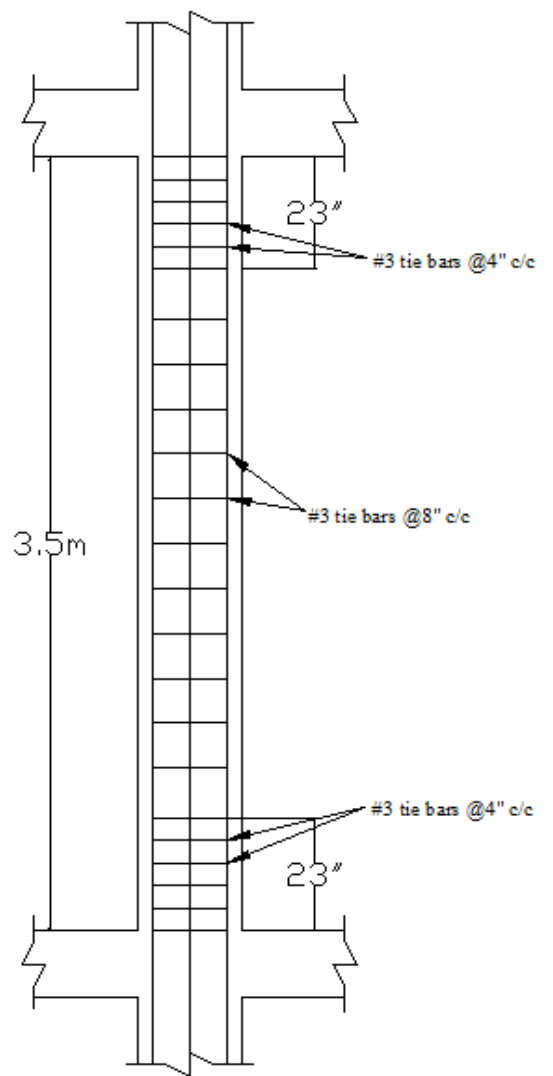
Column rod detailing of CC and CEX for bottom 4 floors
